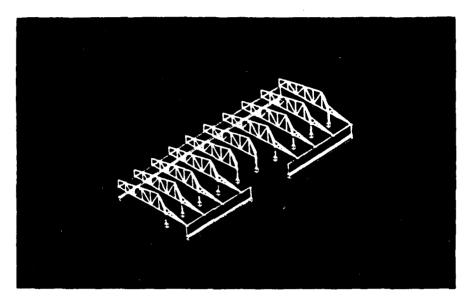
Footings, foundations, columns, and girders are sketched and extruded. Presently, sizing and layout are calculated outside CAEADS. Eventually, an automated interface will be provided.
